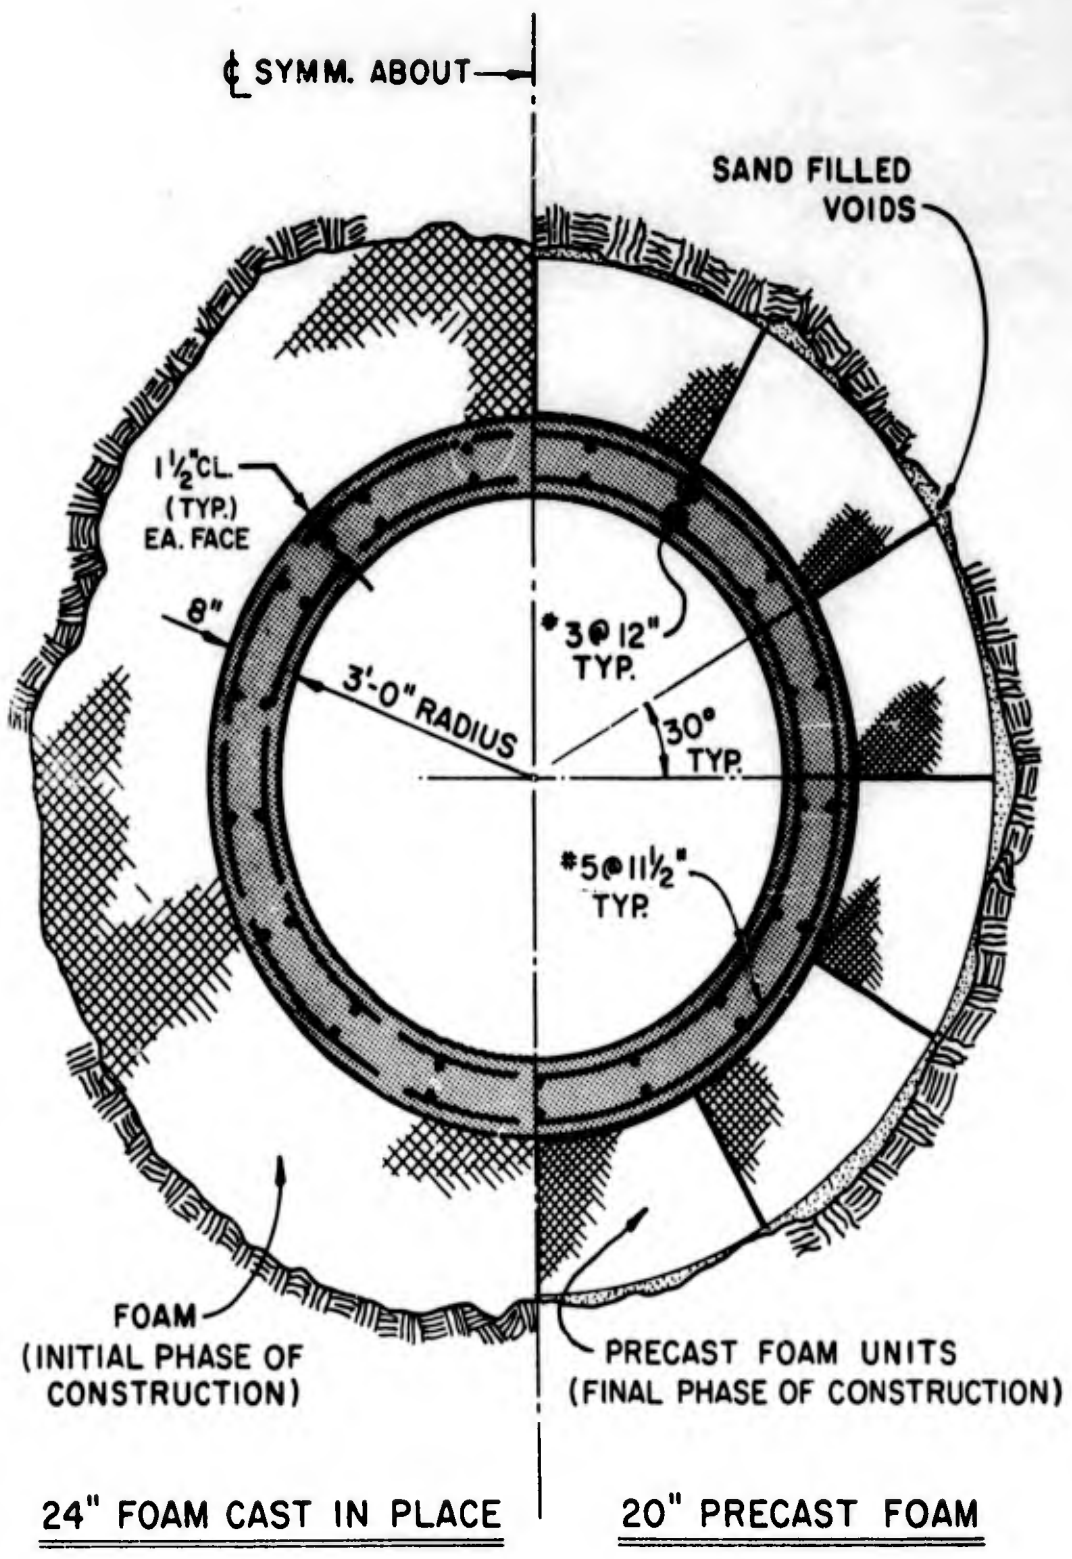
Half sections of two types of 8-inch reinforced concrete liners.
